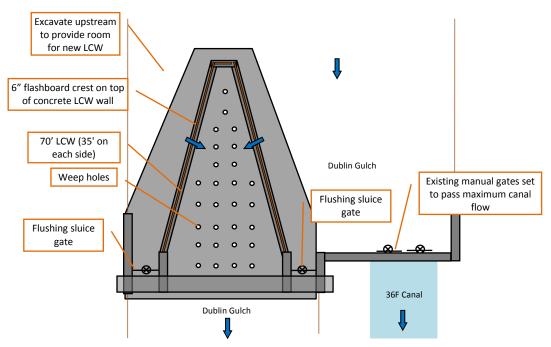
Conceptual plan view of new LCW structure in Dublin Gulch at head of 36F Canal (not to scale)
